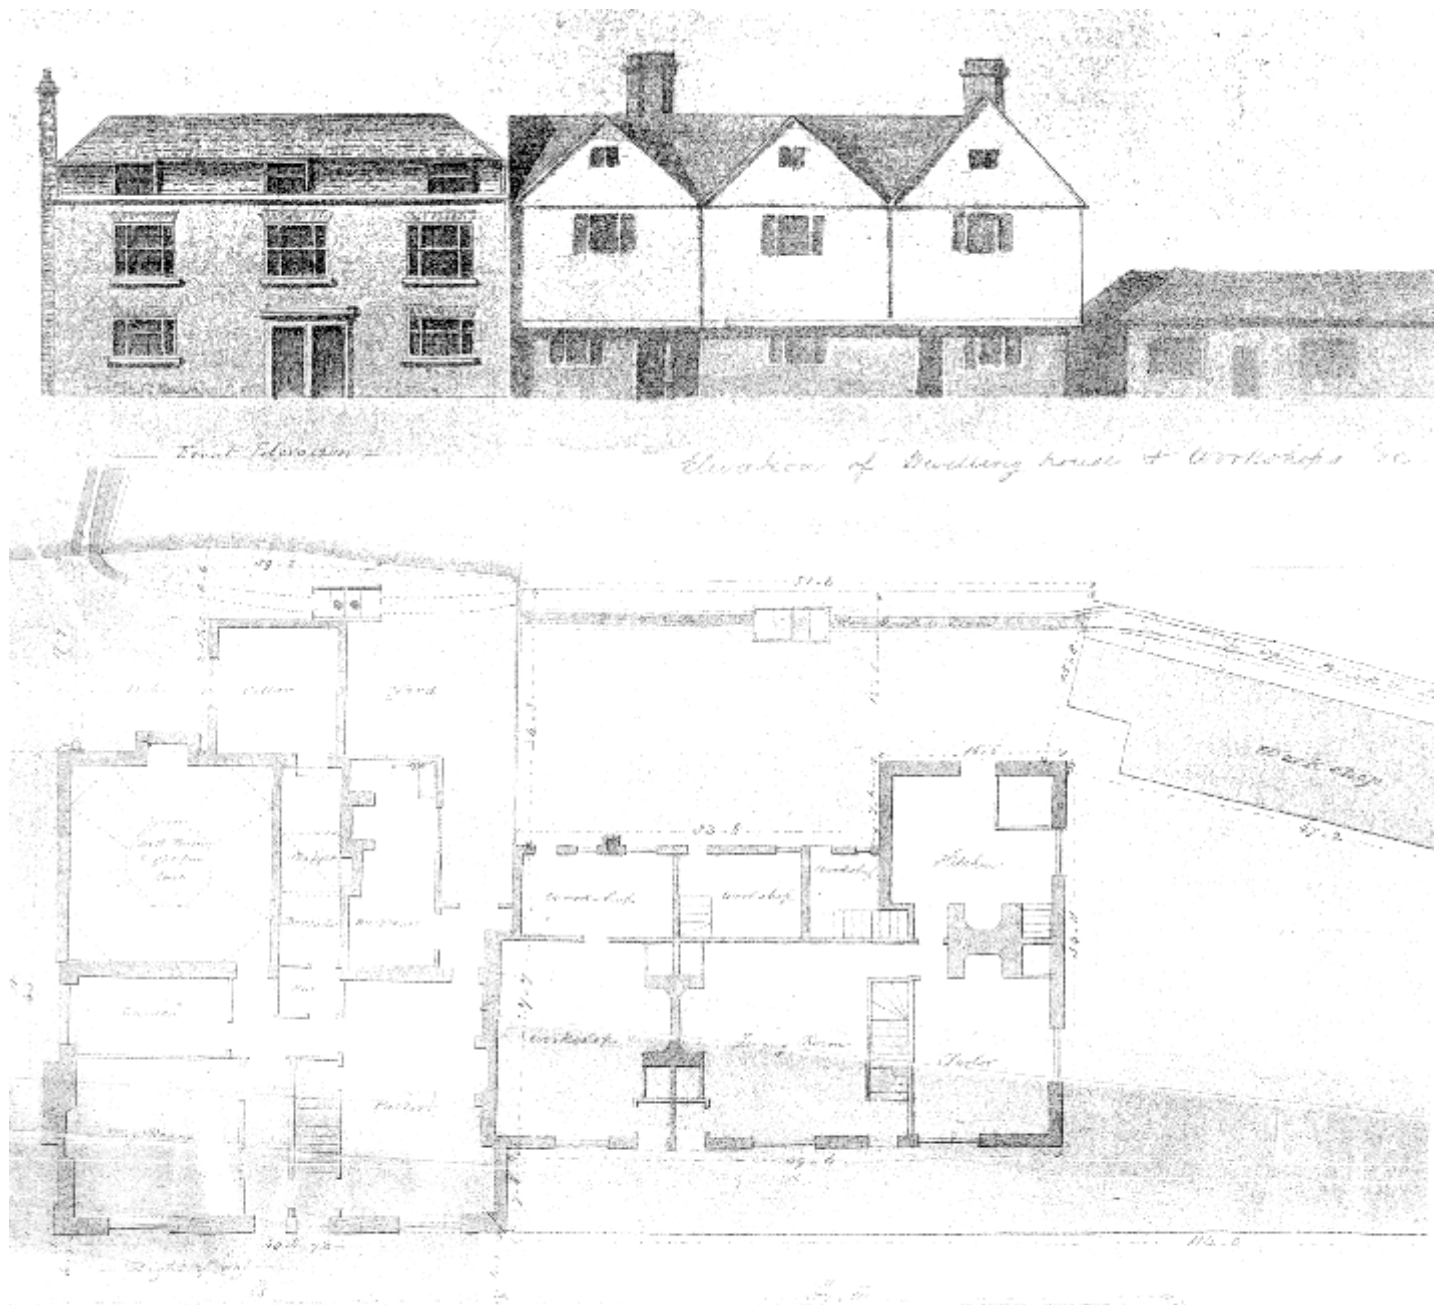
Detail from an estate map 1828-9, showing a plan and south elevation of buildings to the rear of nos 16 (right) and 17 (left) St Radigund's Street.
